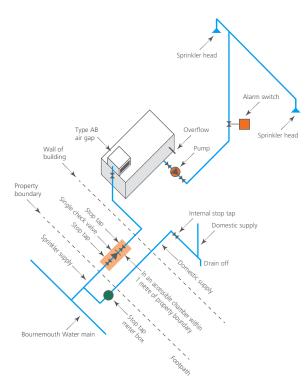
Storage and Boosted Sprinkler Supply via Unmetered Branch Pipe
